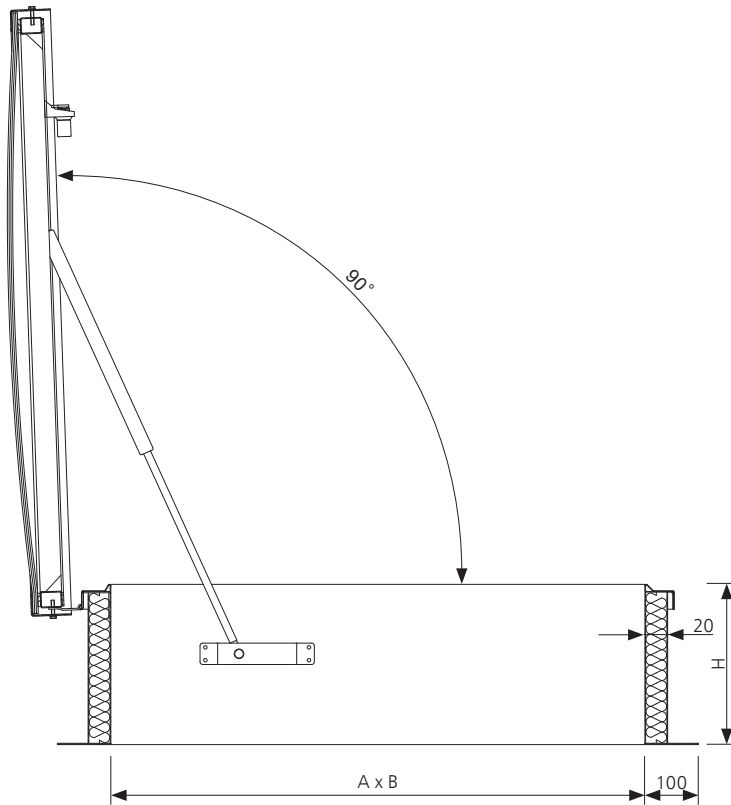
Section B-B of mcr PROLIGHT C roof hatch in open position, dimensions in [mm]
